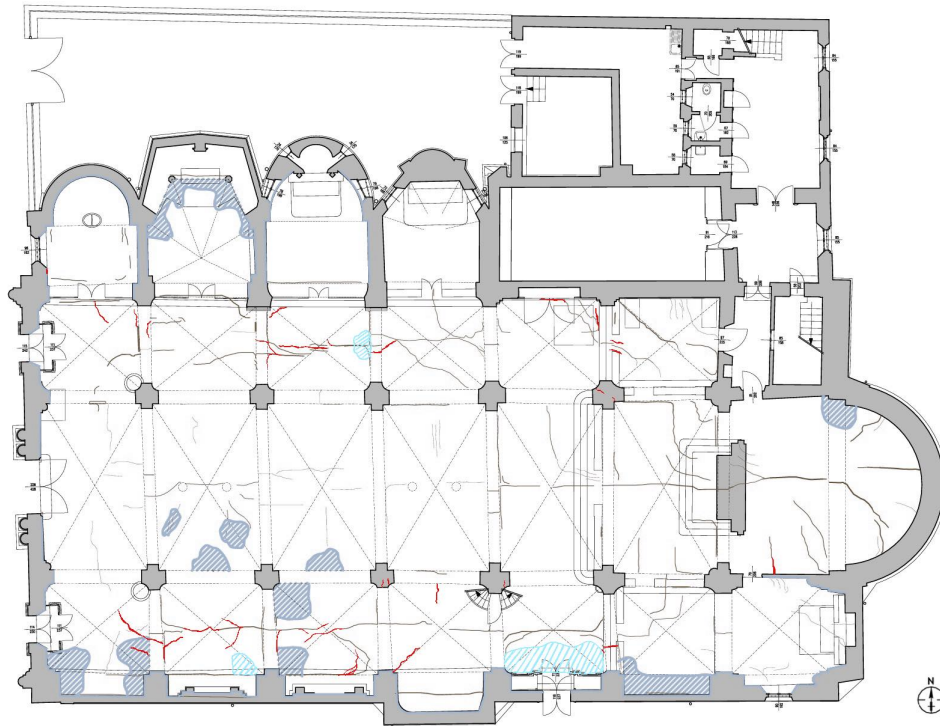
Plan view of crack pattern survey in St. Bassiano with new crack formations in red and new water damage in cyan blue.
